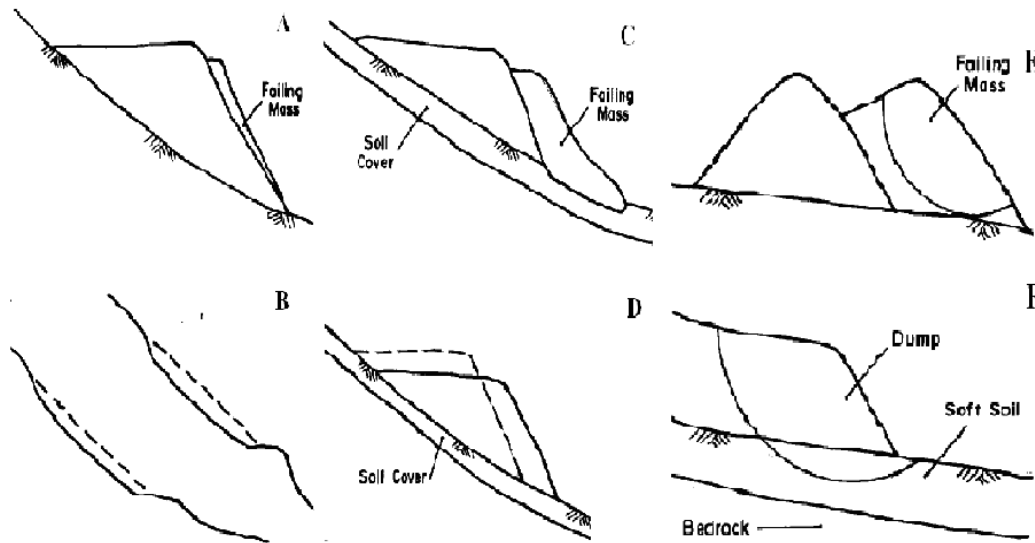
(A) Surface or edge slide, (B) Shallow flow slides, (C) Base failure, (D) Block translation, (E) Circular arc failure, (F) Foundation circular failure
